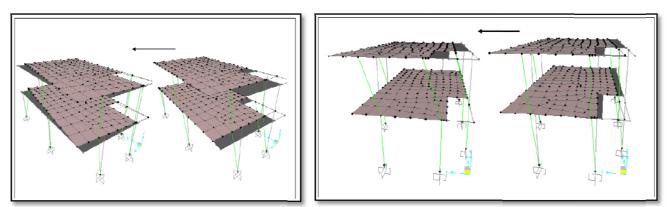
Failure of the first pier during pushover analysis, Left: Failure in N-S direction, Right: Failure in E-W direction
